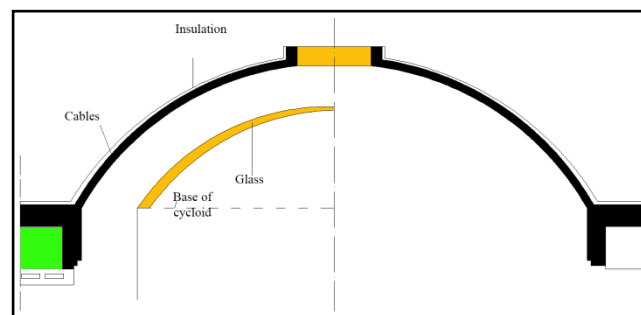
Section of cycloid vault, with glass separation between end arch and walls. Showing non-load bearing wall (Drawn by Author)
